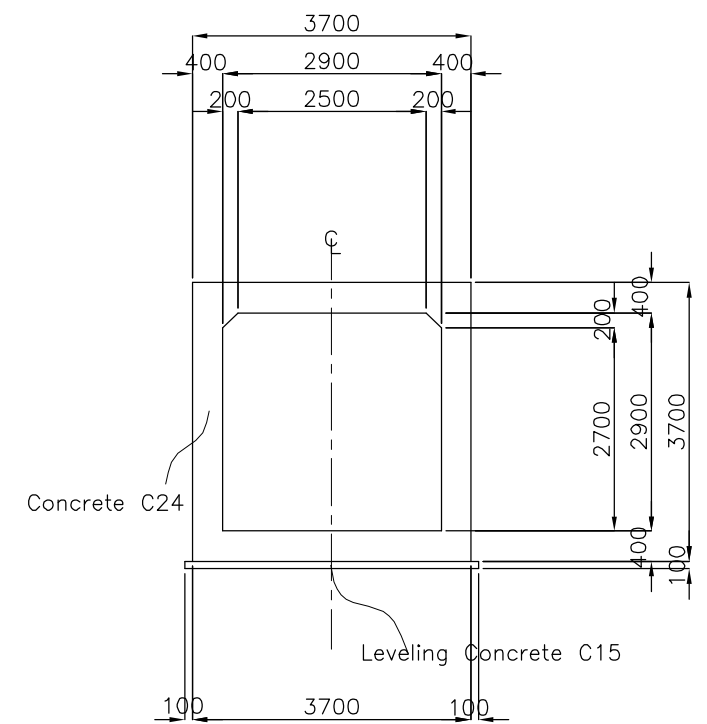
BOX CULVERT 2.5*2.4 S=1:200
